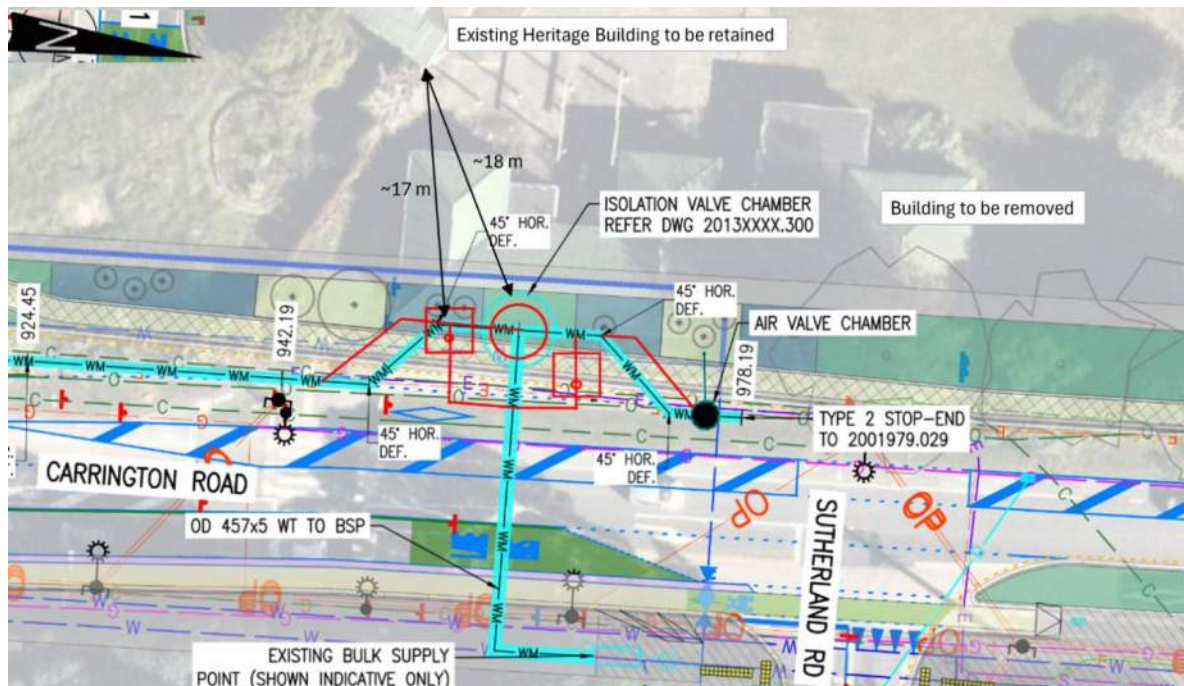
Excerpt of preliminary Carrington Road – Layout Plan and Pipe Longitudinal Section - Sheet 7 (DWG 2013XXX.208 Rev A) showing Isolation and cross connection valve chamber.
